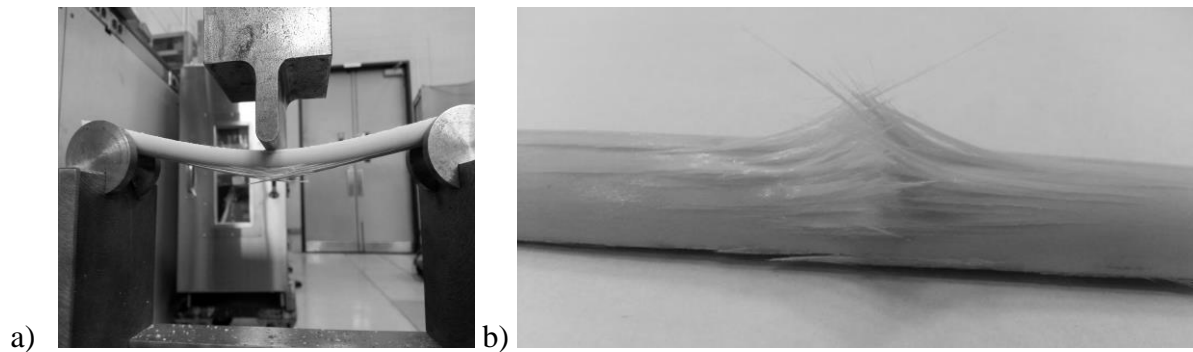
a) Test in progress b) failure mode of specimens tested in flexure
